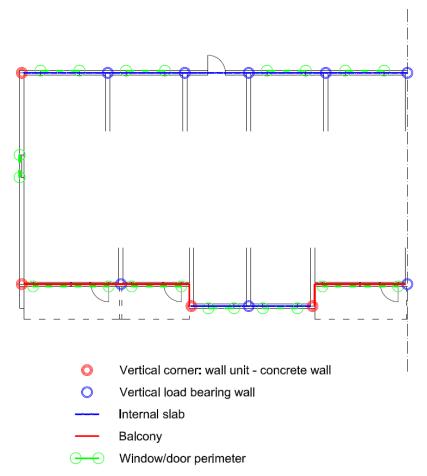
Thermal bridges considered in the model of the reference building. (The beam foundation and roof-wall corner is not shown in the figure, but is considered in the model)
